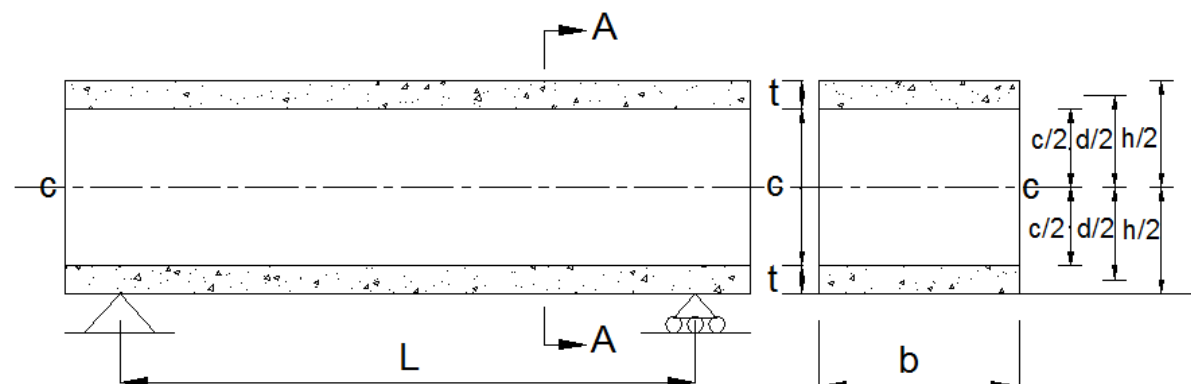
SANDWICH BEAM. SECTION AA ON RIGHT [11]
